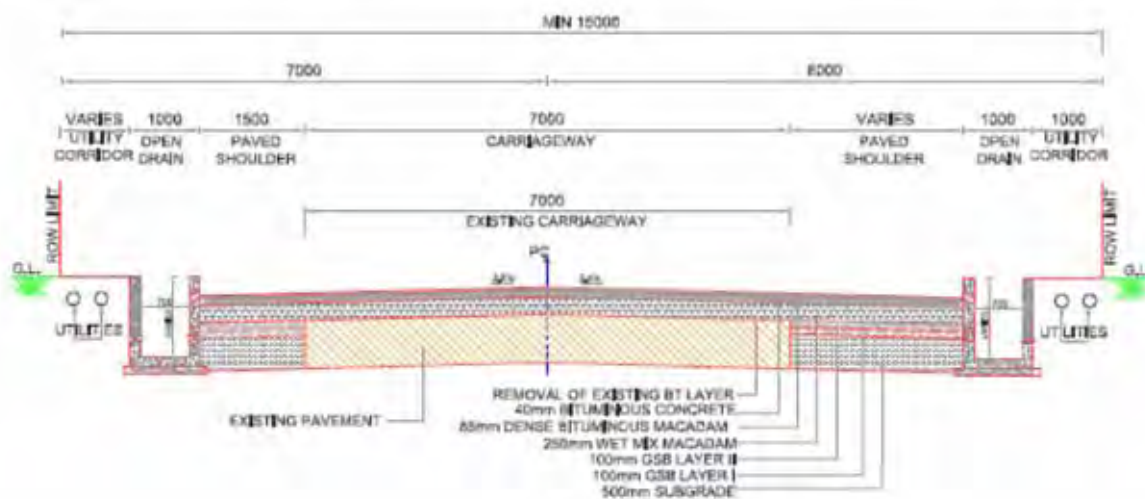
C4-F – O Two Lane Carriageway with Paved Shoulder in Forest Area – LHS (Overlay)
